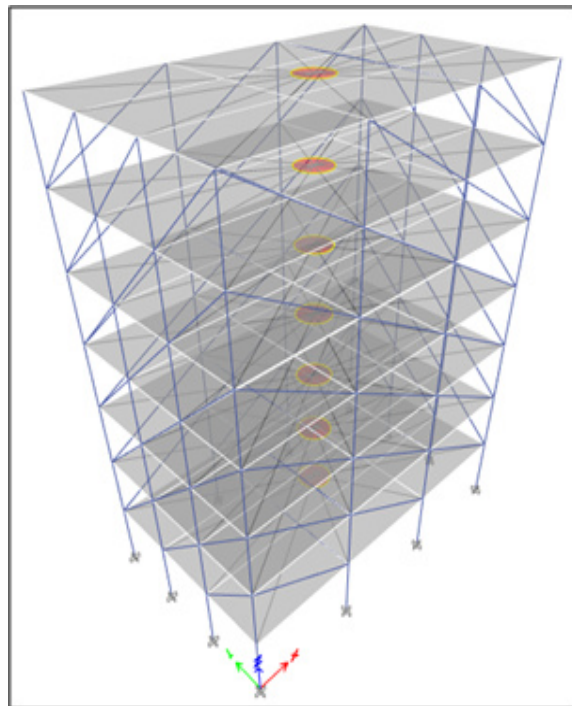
3D View of Model with in-filled frame single strut approach from 1st story.
